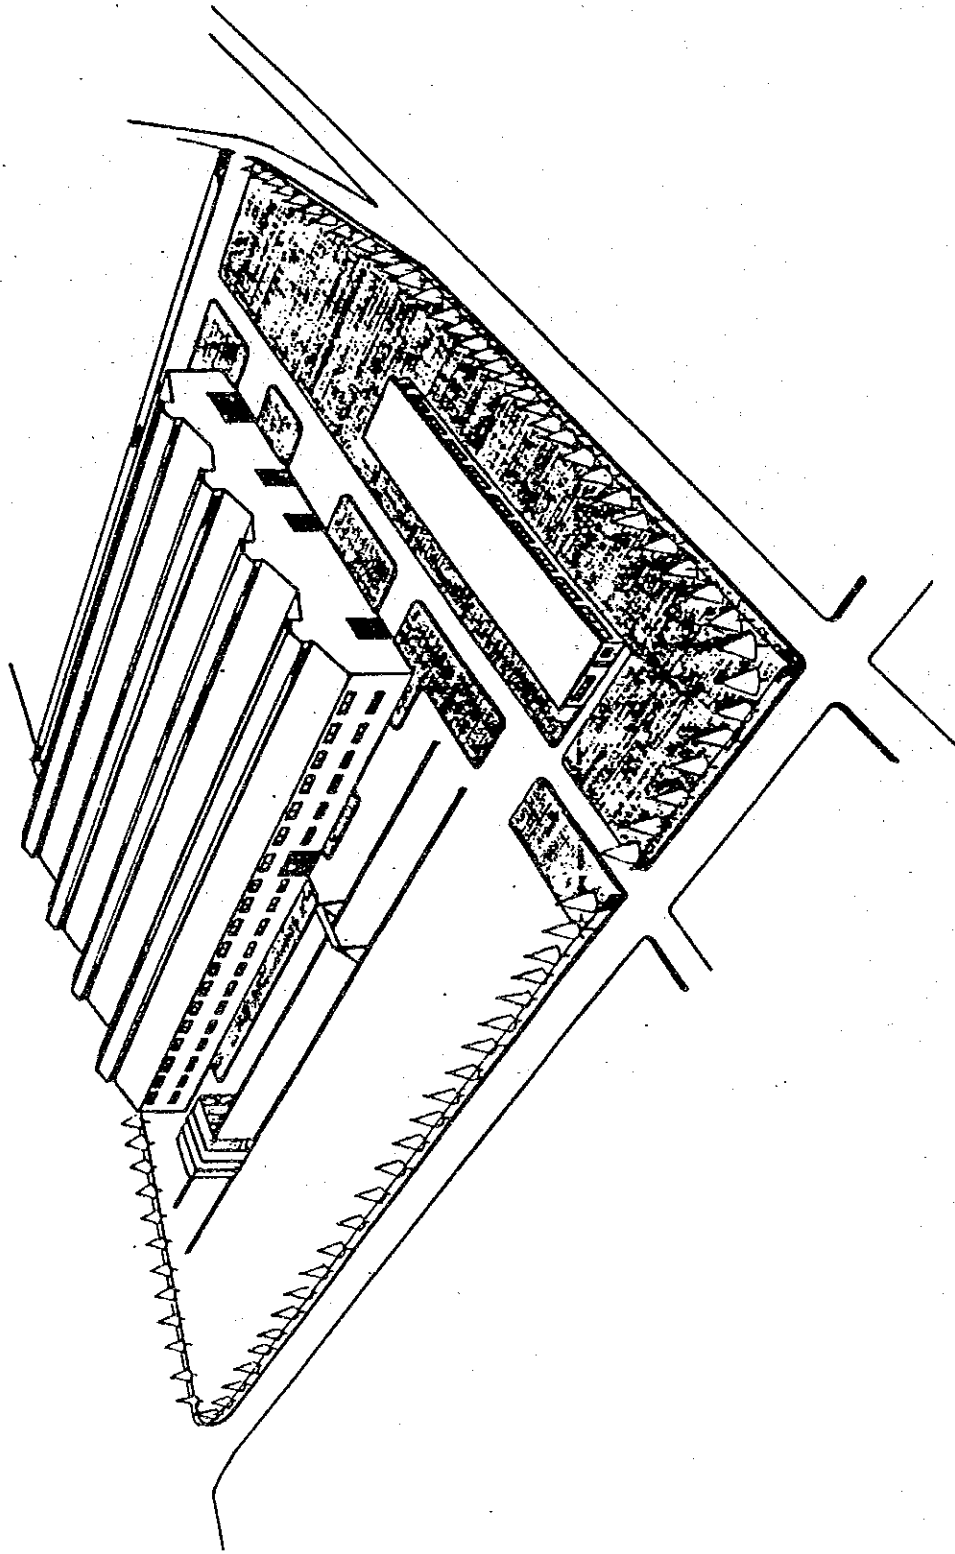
BIRD'S VIEW OF SHOP BUILDING
